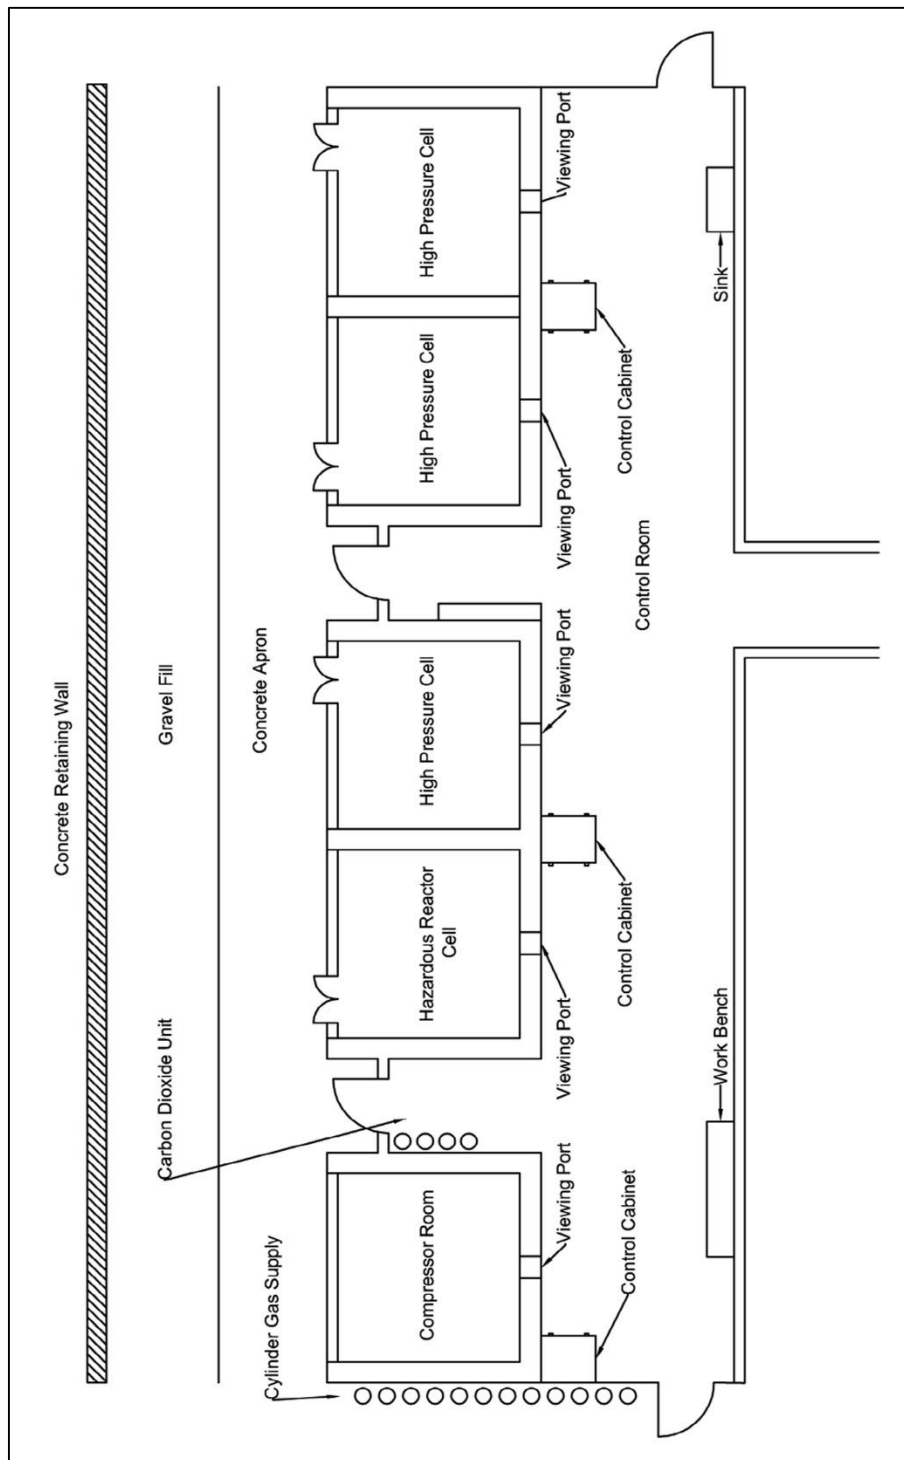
Schematic of a barricade setup with its rooms side by side.²
